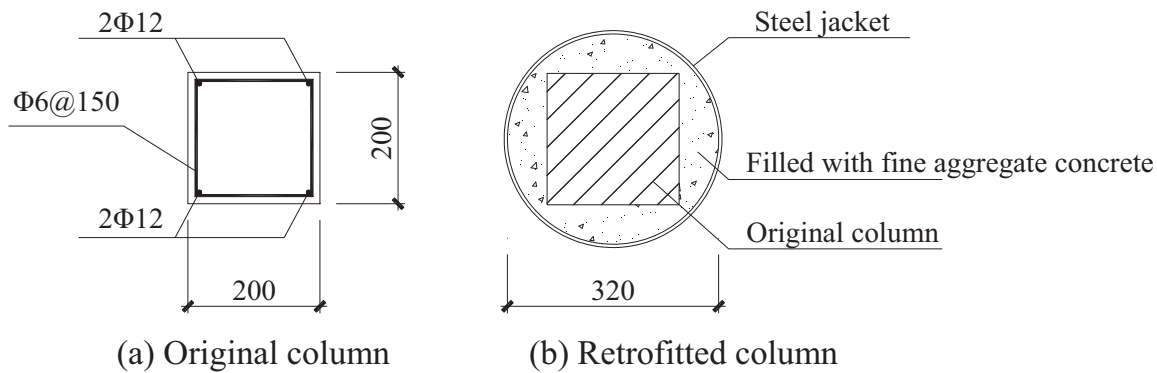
Cross-sections of specimens. (a) Original column (b) Retrofitted column.
